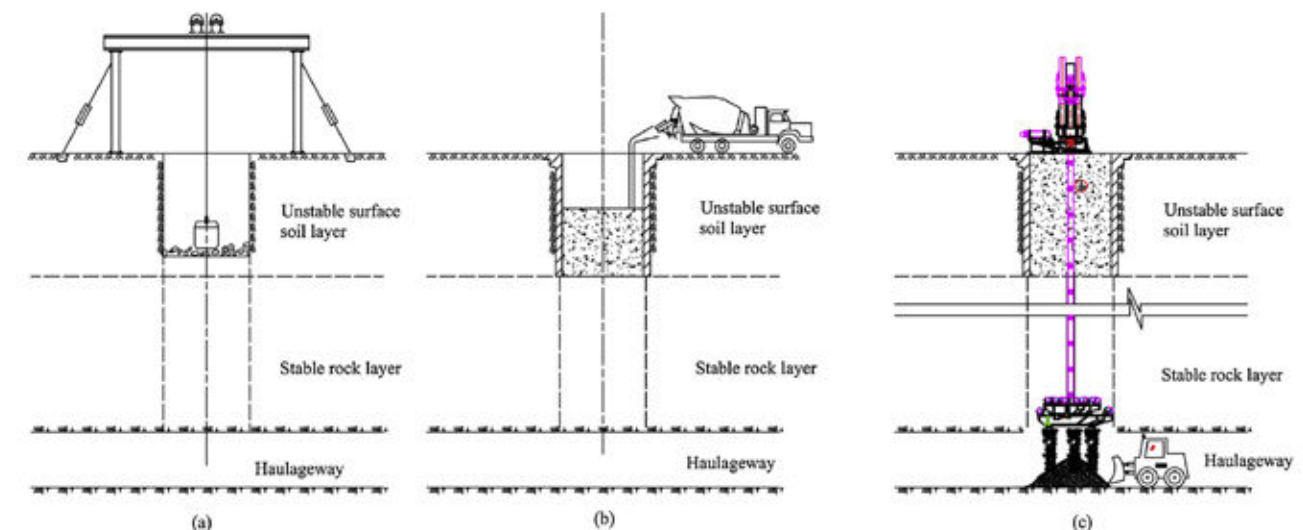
Support process of upper unstable strata. (a) Excavation; (b) Pouring concrete; (c) Back reaming.
